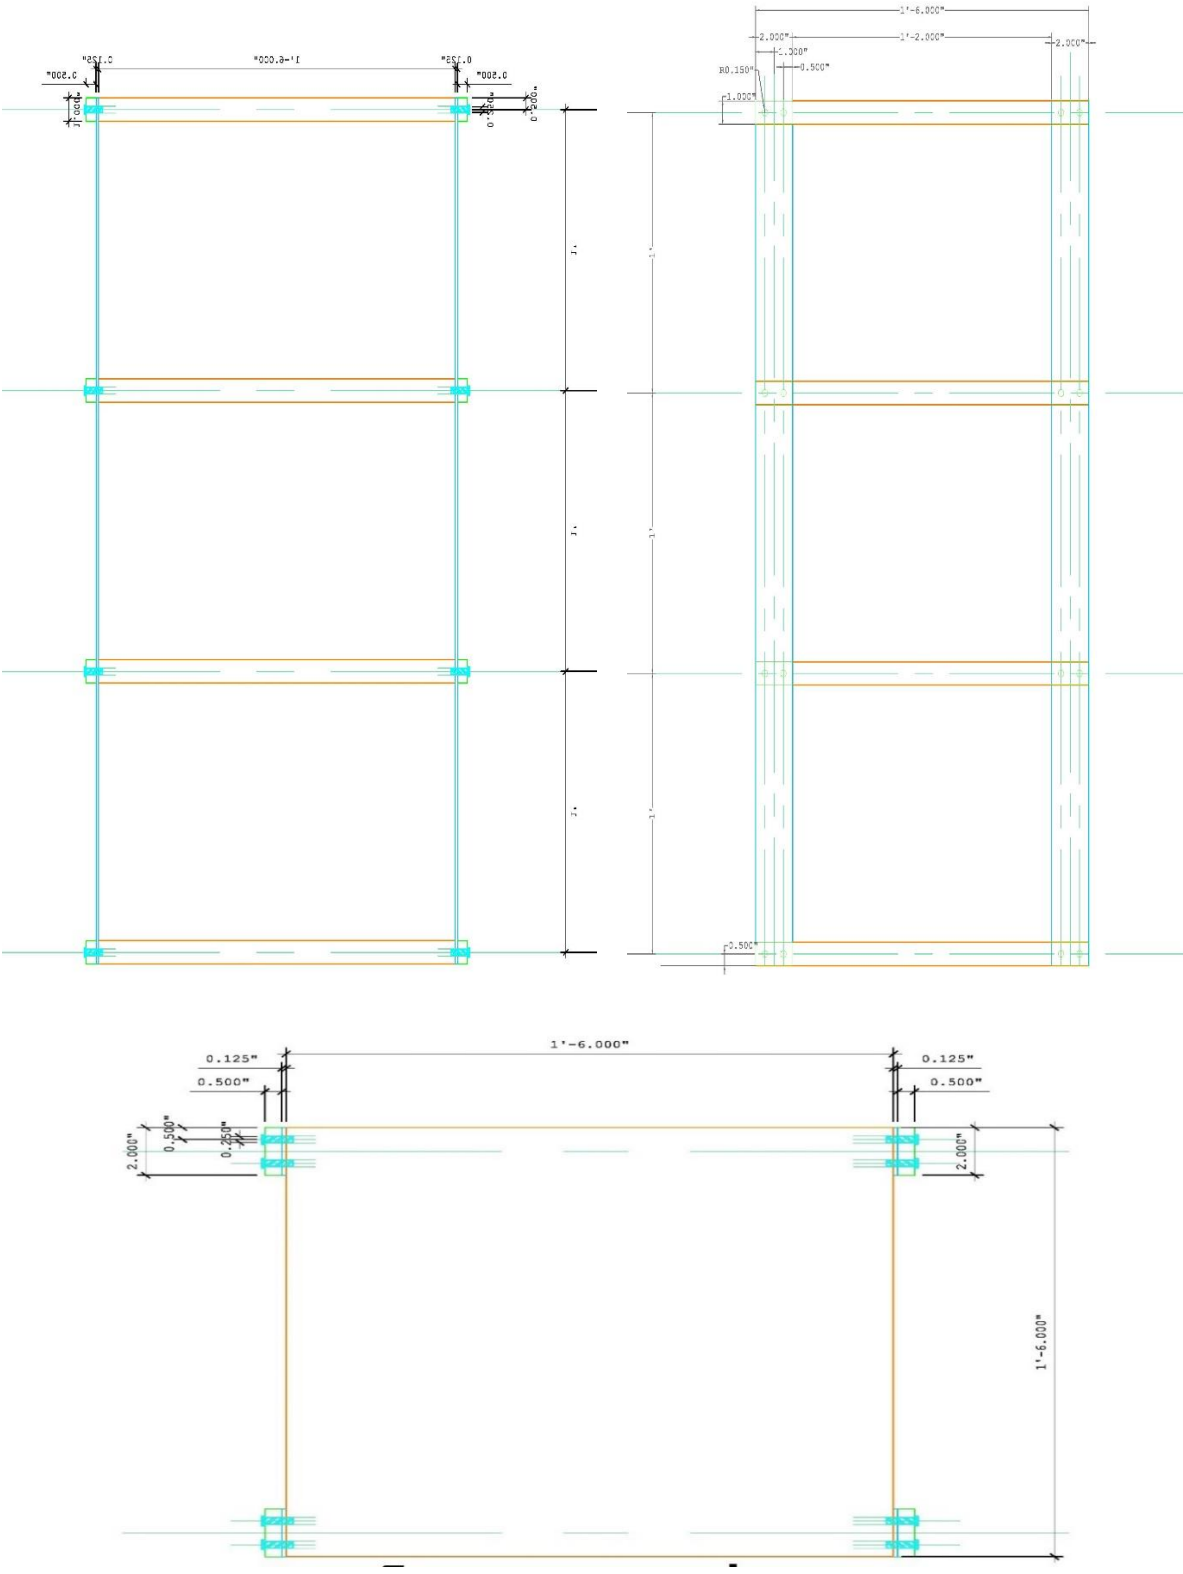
Elevation (top) and plan (bottom) and views of the three-story scaled structure
